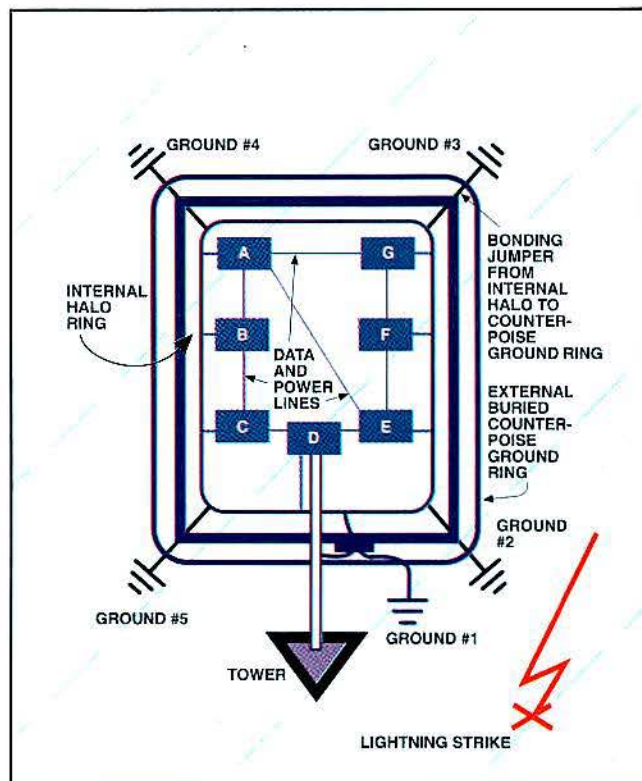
In many sites, an internal halo ground is installed at the shelter perimeter and bonded to ground at all four corners. Site equipment is bonded to the halo at a convenient location, so any given piece of equipment samples the closest grounding point. During a nearby lightning strike, the ground potential at one corner of the site could differ vastly from the ground potential at any other corner.
